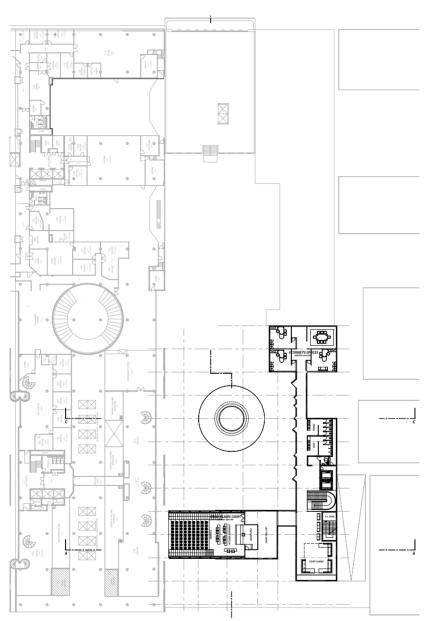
13 - First Floor Plan NTS (Source: Author. 2013)
